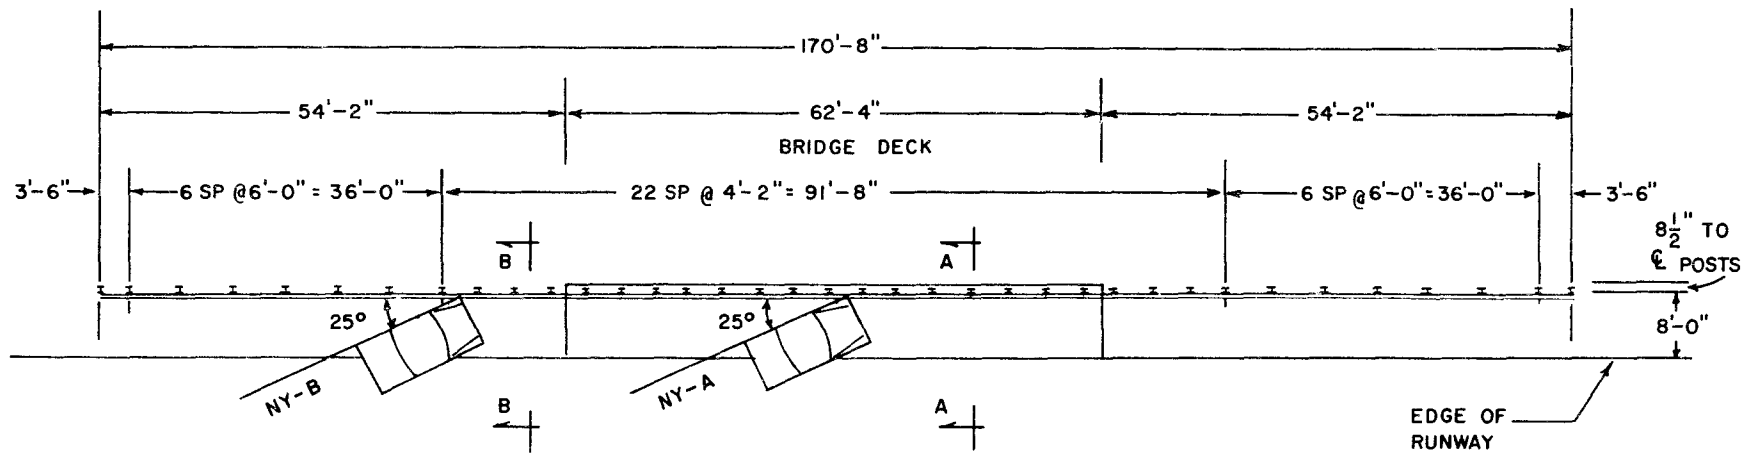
, BRIDGE RAIL AND GUARDRAIL SECTIONS
